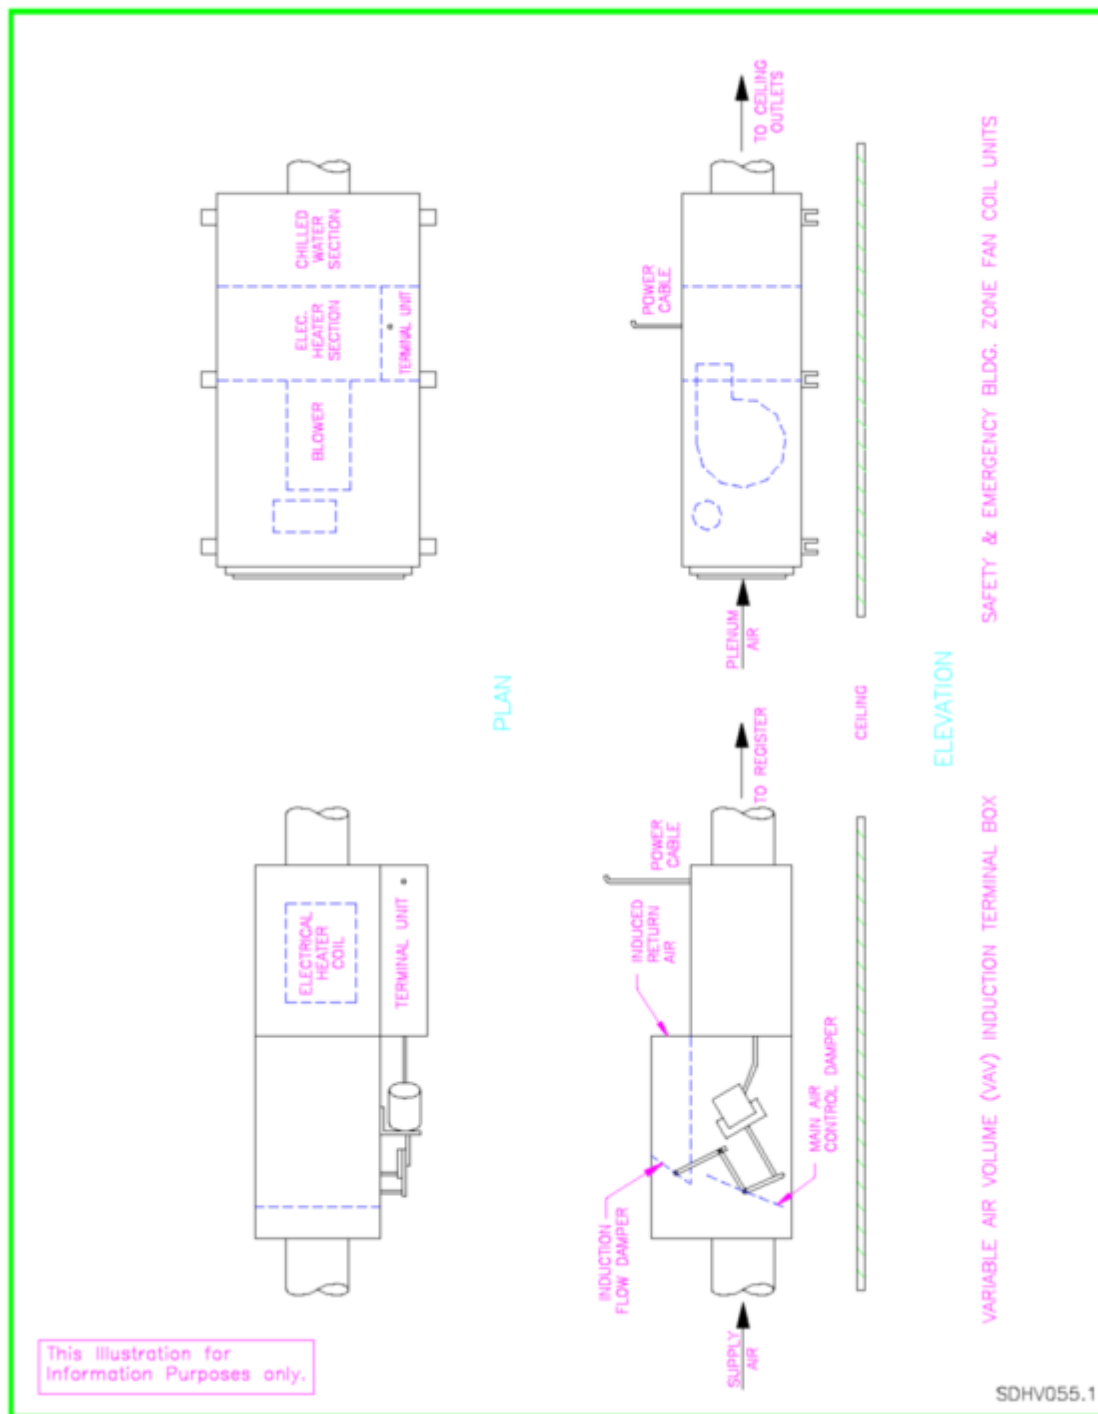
HV04 & HV05 Ceiling Air Handling & Terminal Units
